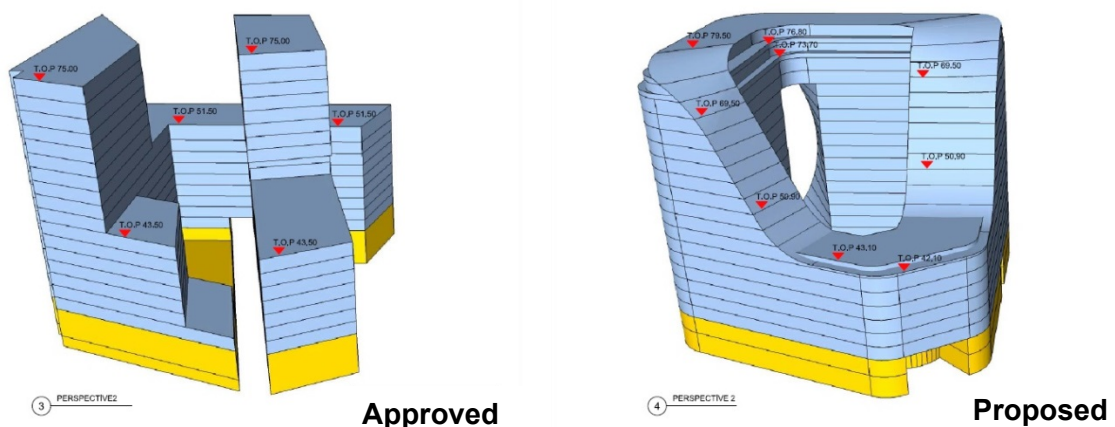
Comparison between approved Stage 1 building envelopes and proposed envelope, as viewed from Botany Road and approved Plaza and Library
